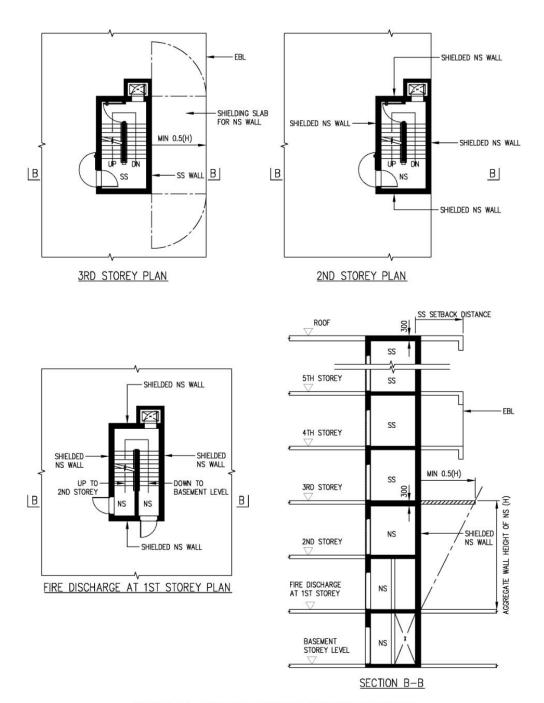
C: SHIELDED NS WALLS OF S/C SS TOWER
